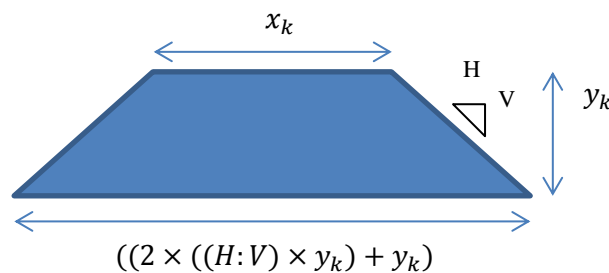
Schematic diagram of an embankment cross-section with its geometric properties.
